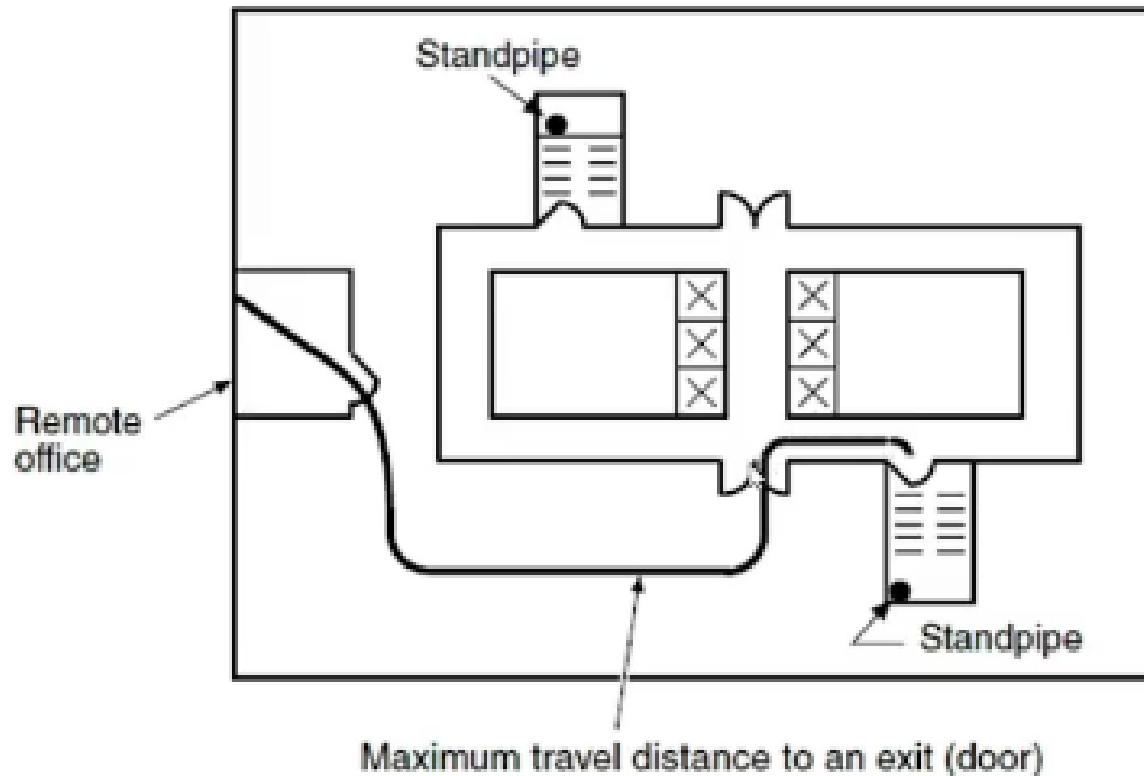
Exit Location Method for Locating Hose Connections
